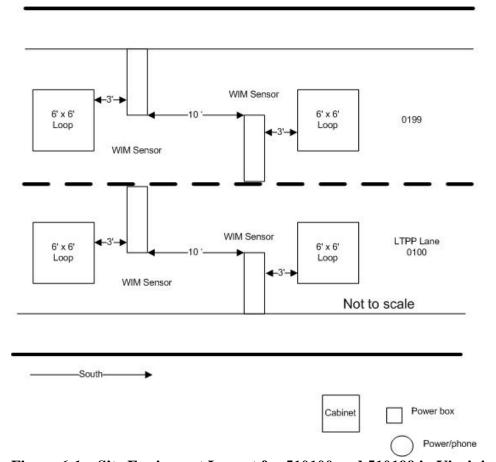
Site Equipment Layout for 510100 and 510199 in Virginia
